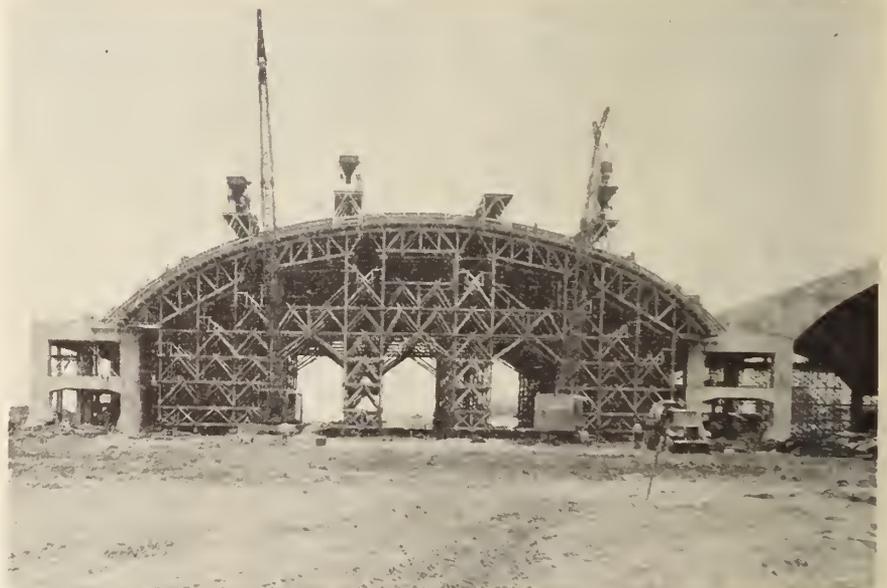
Twin hangar built for U.S. Navy. Formwork and arrangement of runways.
